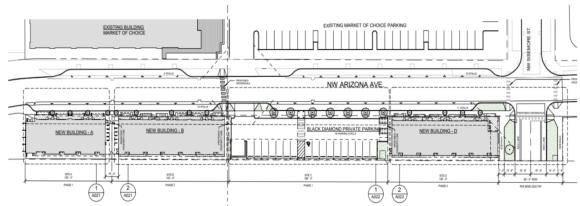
Proposed Site Layout. Source: Steele Associates Architects, LLC.
